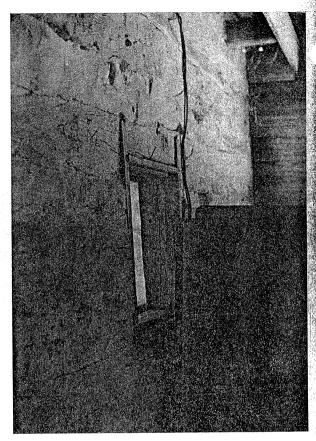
Back wall of slave house at Howard's Neck, showing log construction and original exterior treatment. (Photograph by Dell Upton.)
